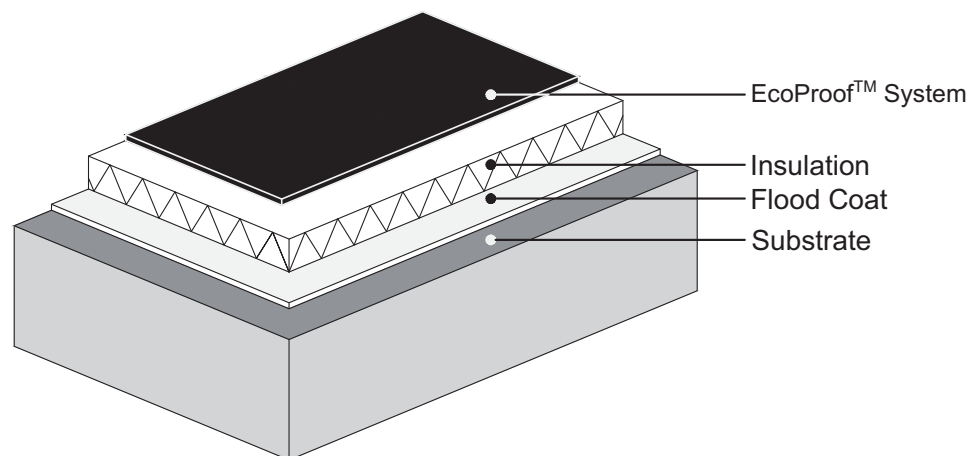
Typical build-up of flat roof application of the EcoProof™ Roofing System with additional thermal insulation
